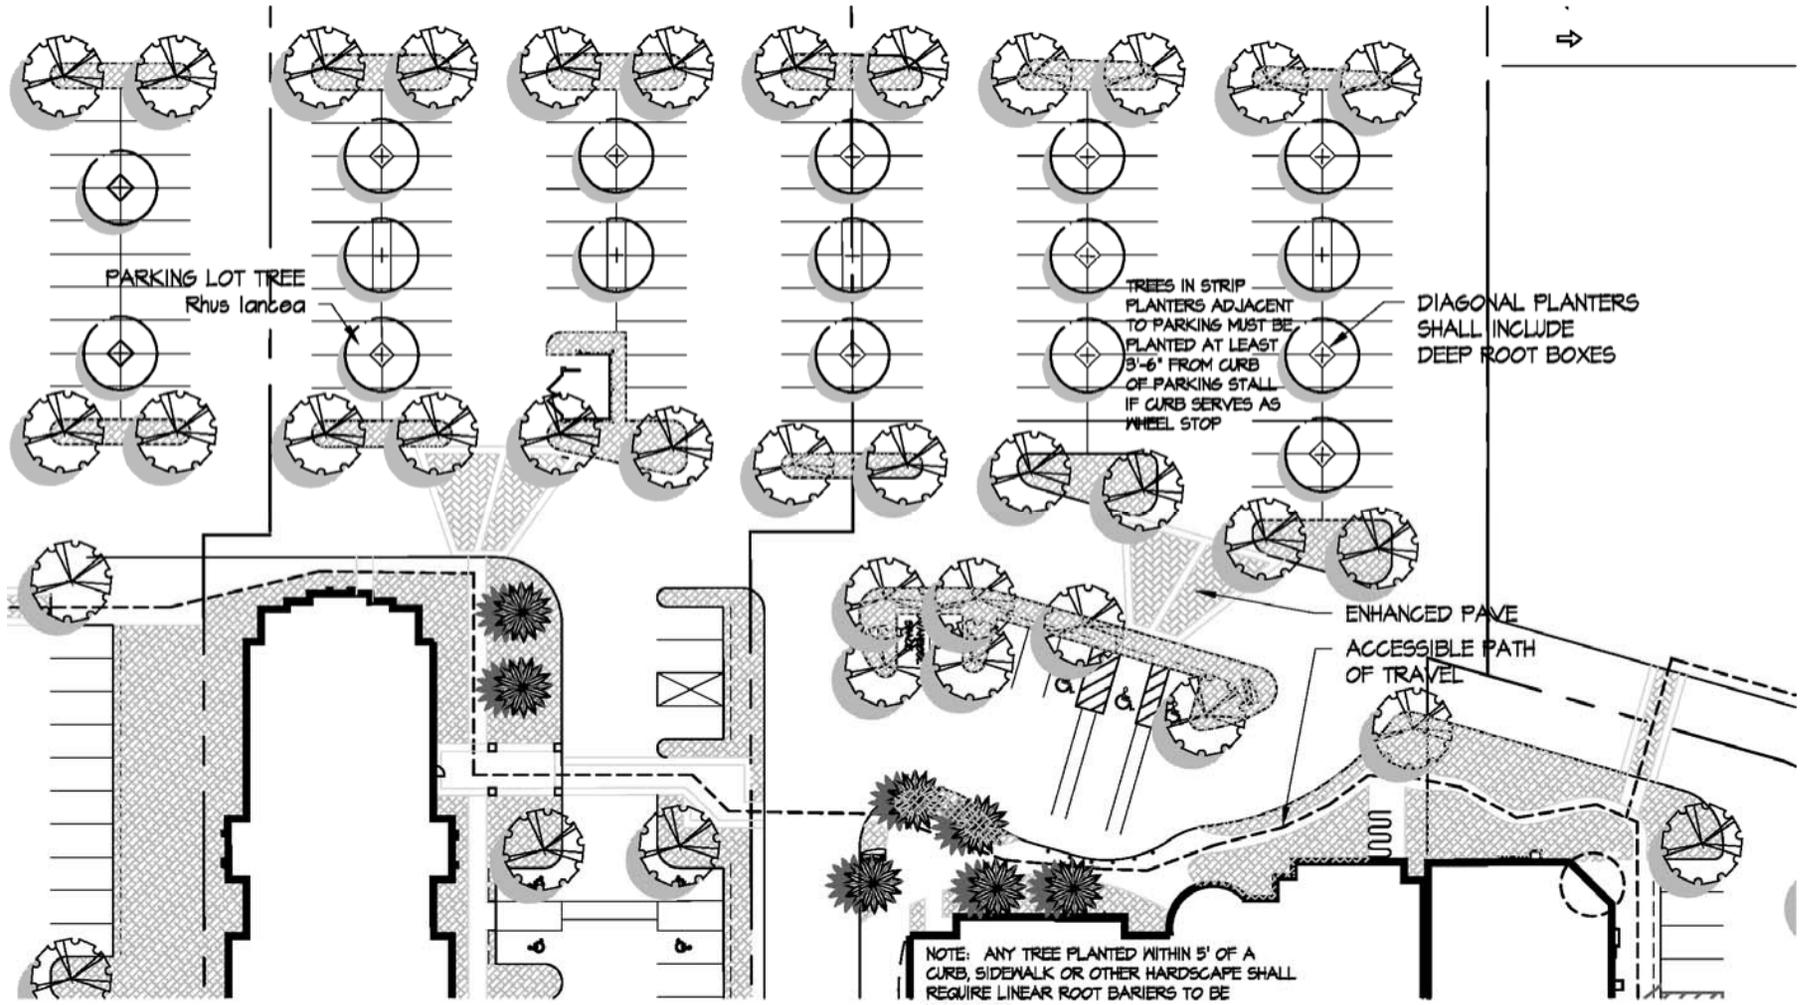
A BUILDING ENTRY LANDSCAPE/HARDSCAPE CONCEPT
